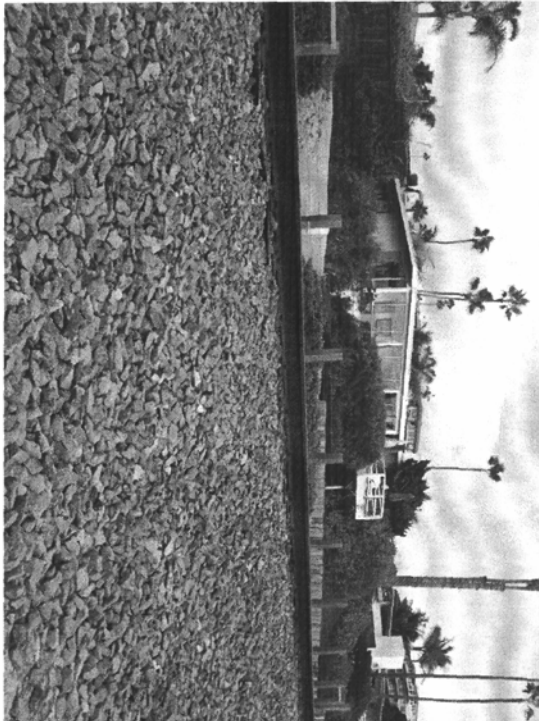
At railroad track, looking toward project site. Wall will be mostly obscured from beach by Beach Trail and railroad tracks.
